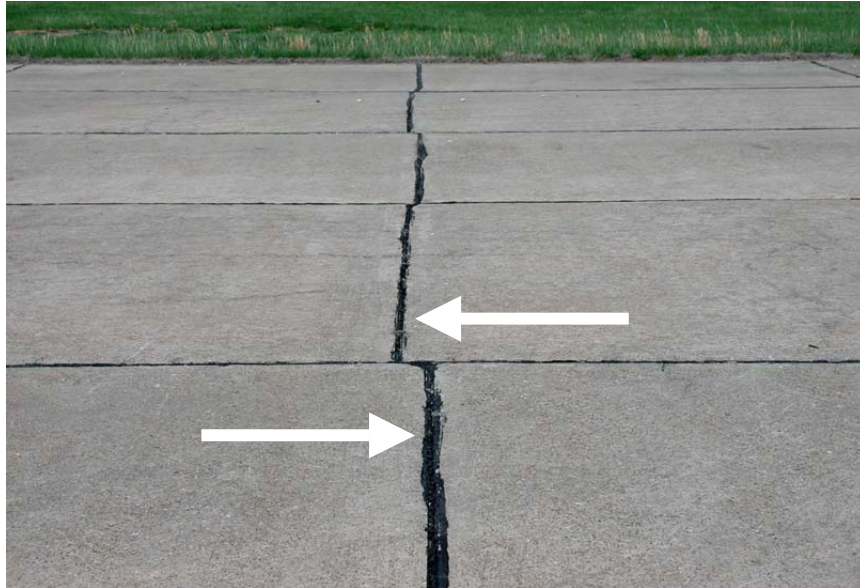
Misalignment of joint (→) caused by slab movement.
